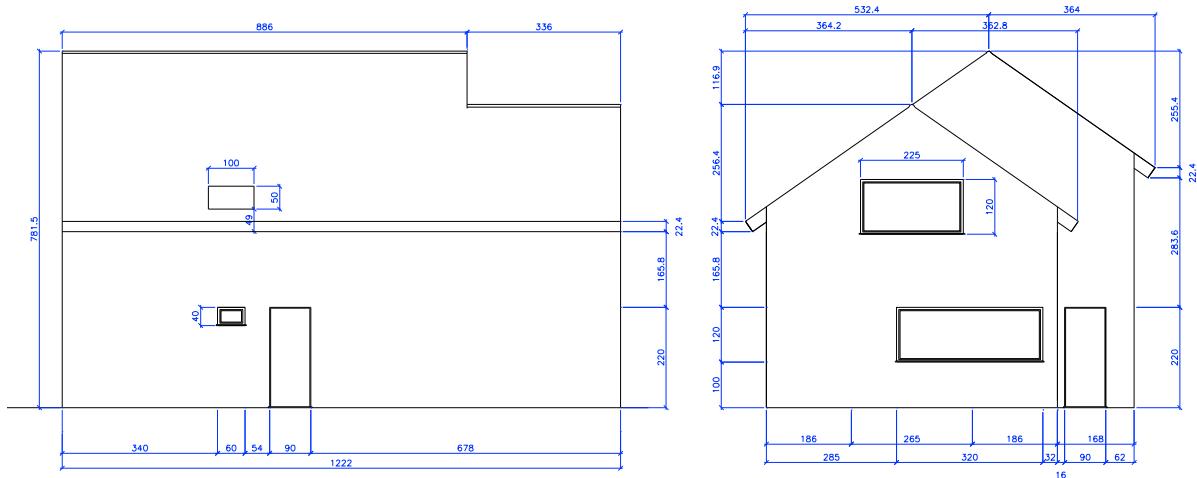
Detached house: North elevation (left) and West elevation (right)
